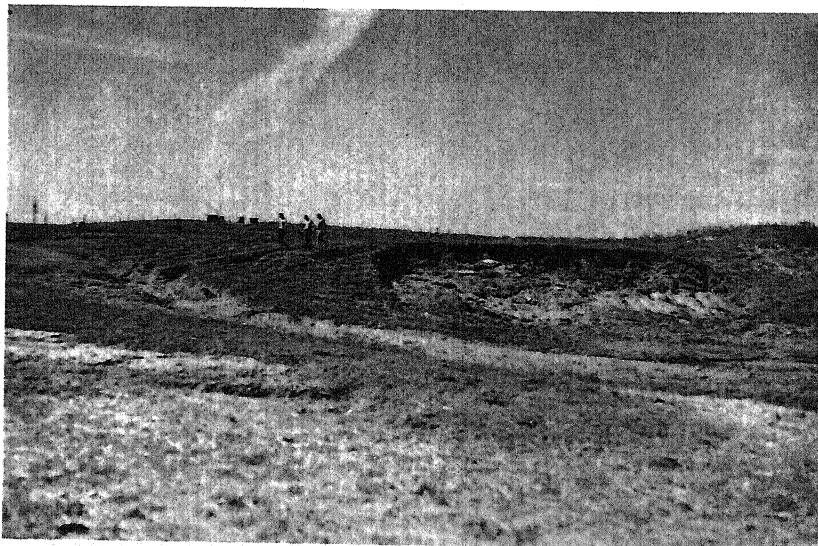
Outlet end of site 24 emergency spillway after flood of October 10-11, 1973.
